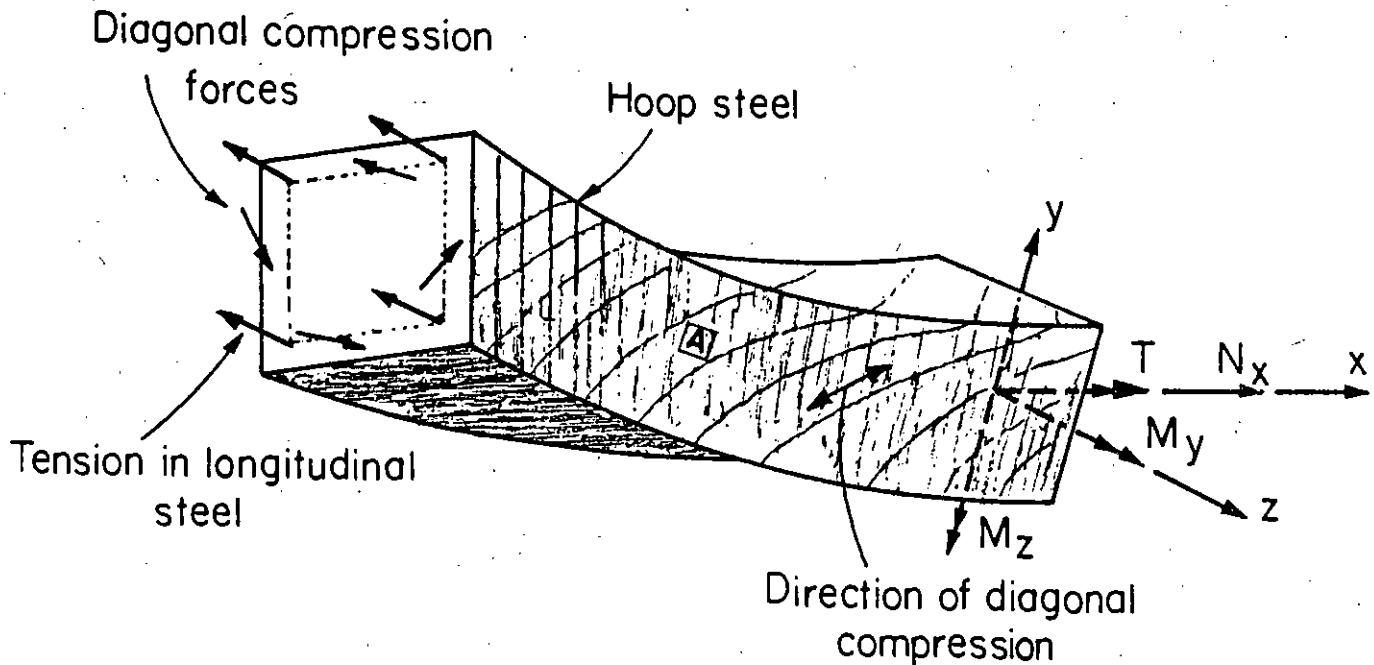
CRACKED REINFORCED CONCRETE BEAM MODEL.
